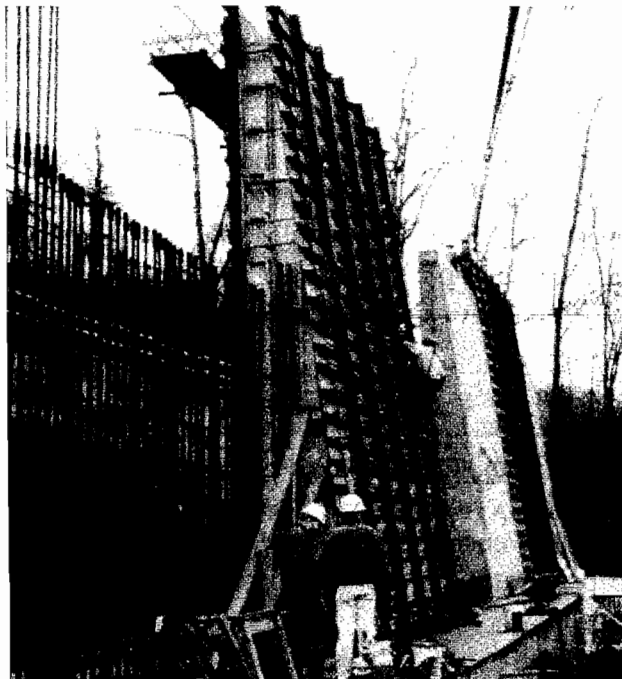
Formwork and reinforcing steel for wall stem of cantilever wall.
